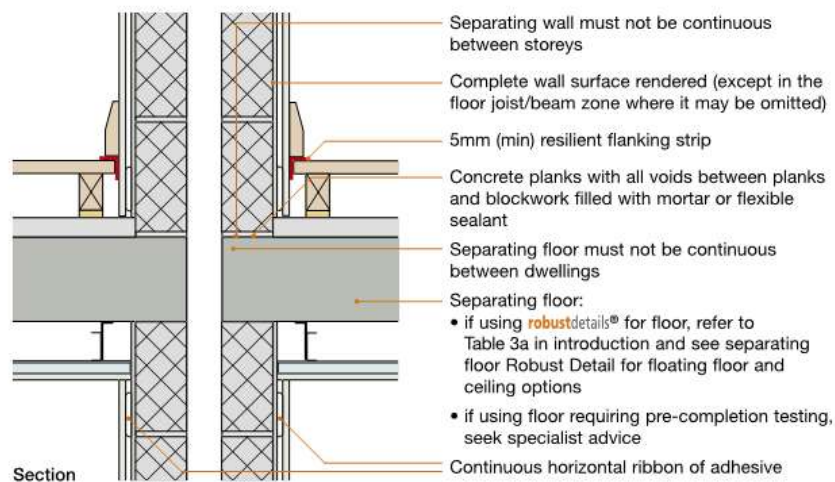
Indicative separating wall to separating floor junction detailing for cavity masonry wall construction
